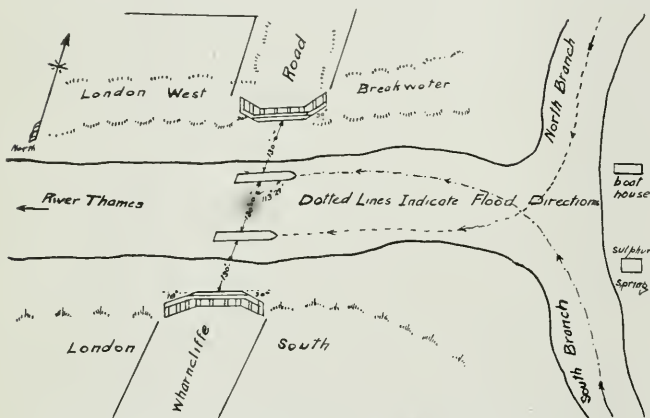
Location and Layout of the Wharncliffe Highway Bridge, London, Ont.
